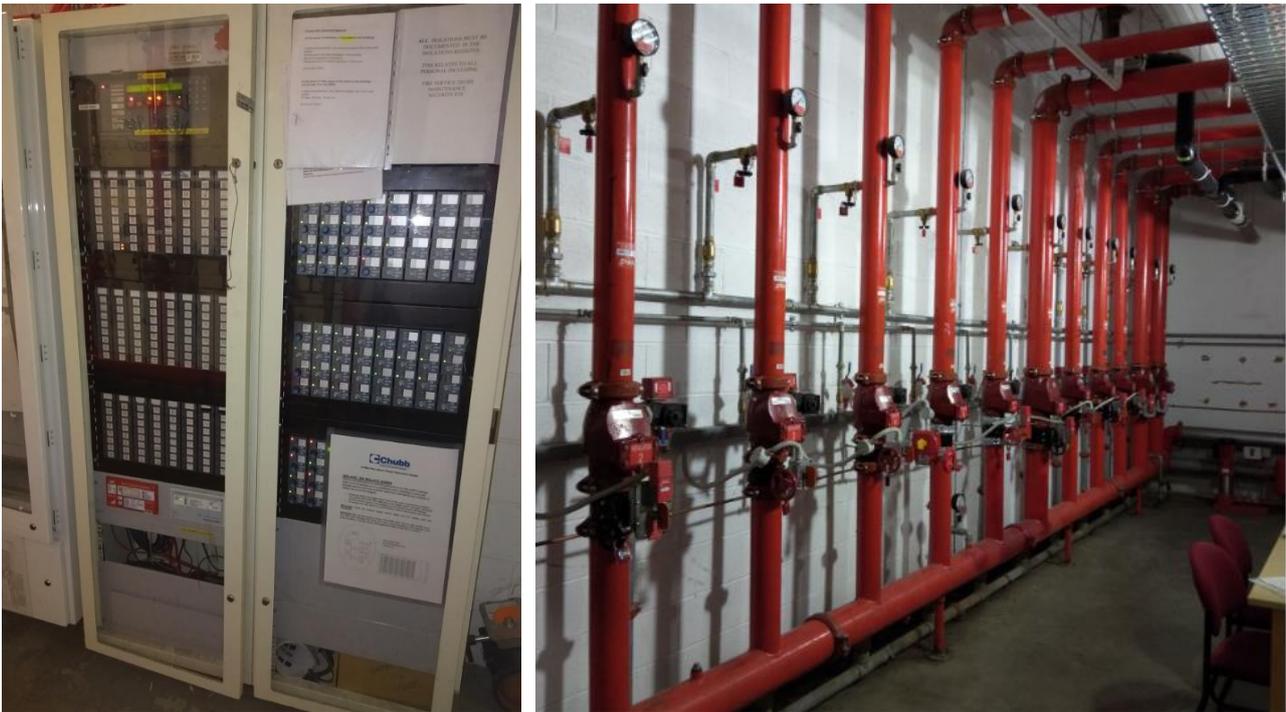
North side – Fire Control Room (adjacent to David Jones / Loading Bay)
